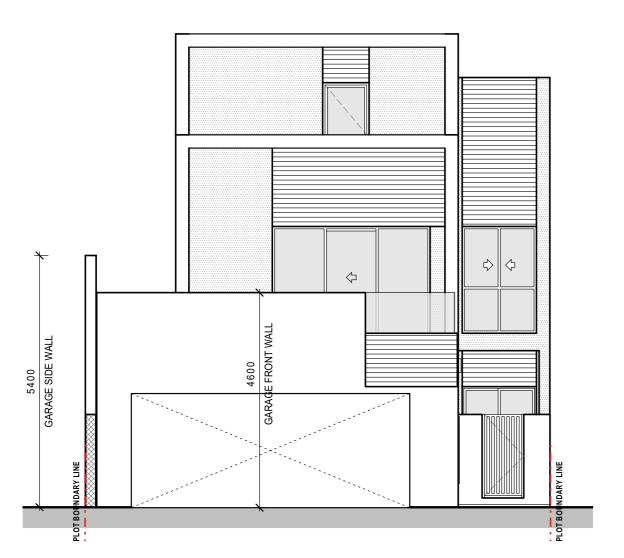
Front Elevation showing boundary wall and entrance for 5.5 / Layl 2
